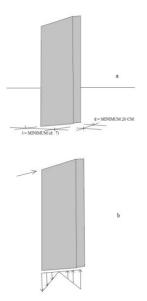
a. Minimum dimensions of reinforced concrete shear walls b. Transfer of horizontal load by reinforced concrete shear walls
